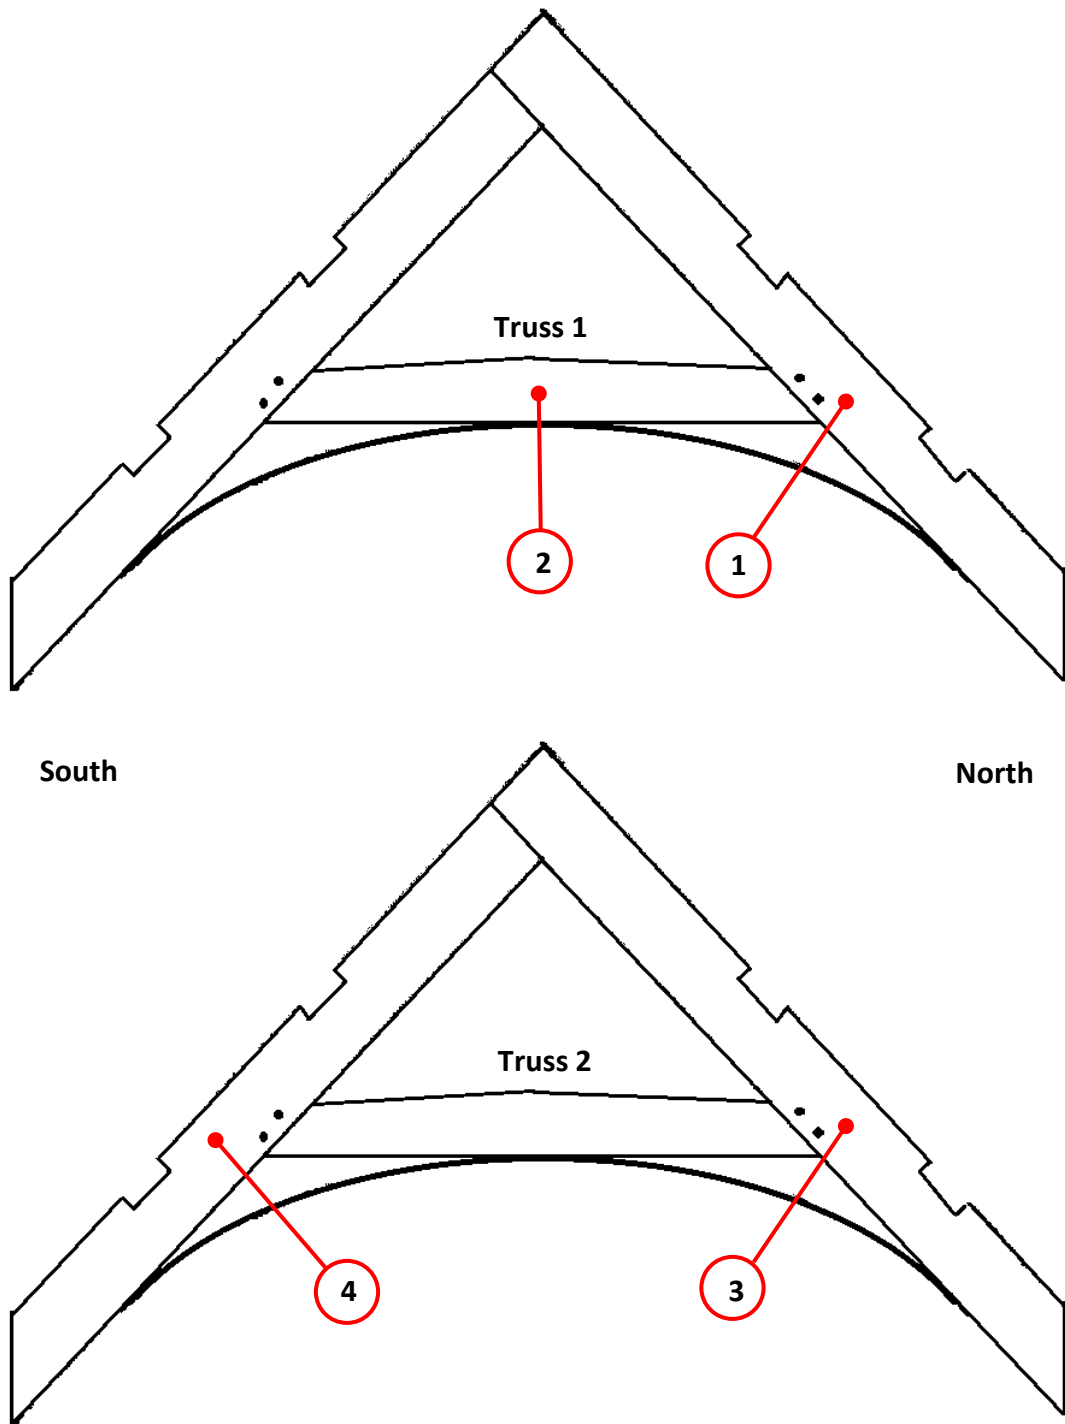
/b: Simple schematic drawings of the south range roof trusses to locate the sampled timbers
